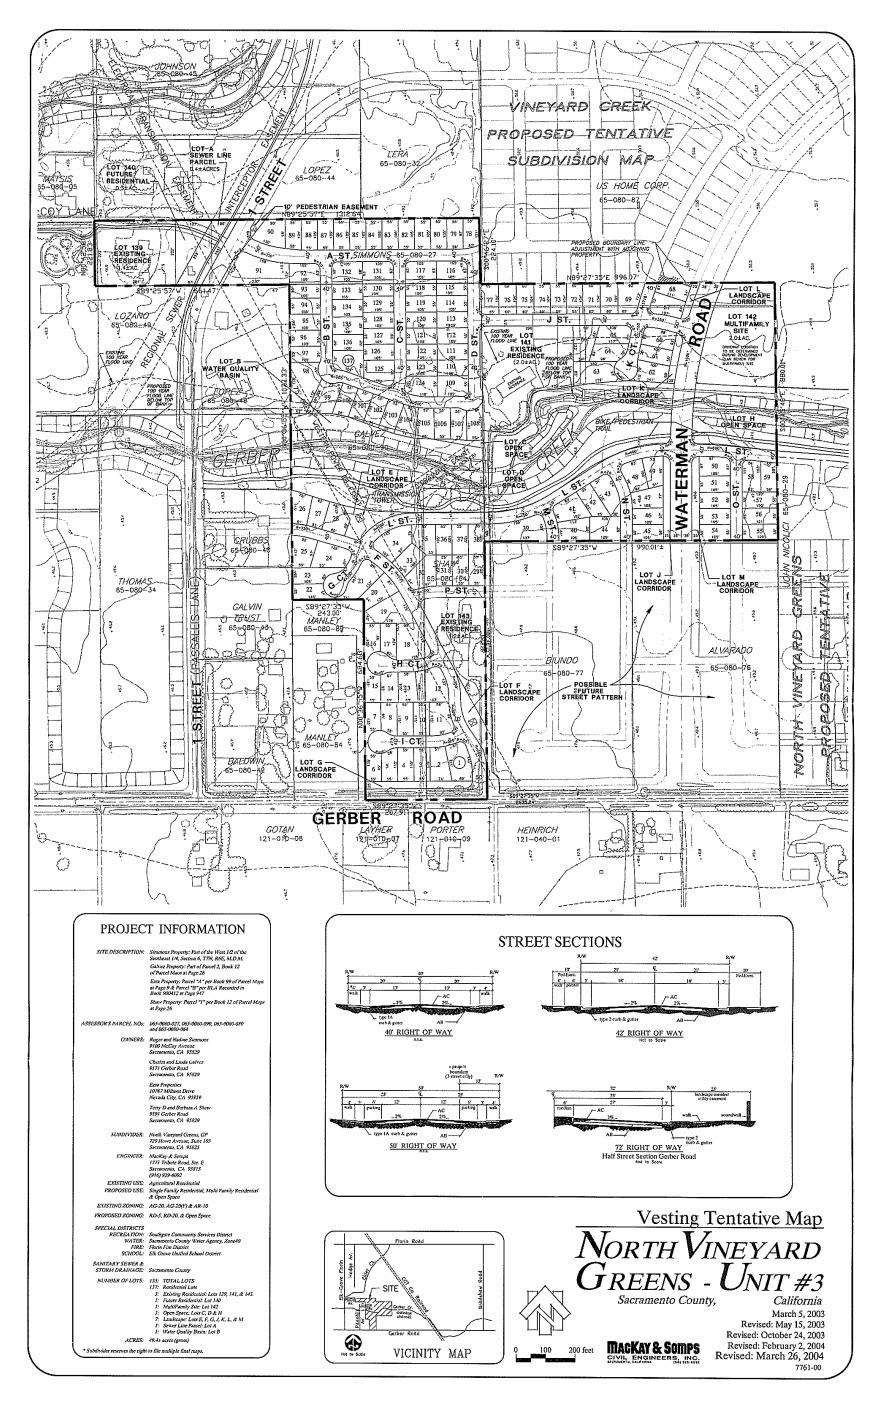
North Vineyard Greens Unit 3 Site Plan
